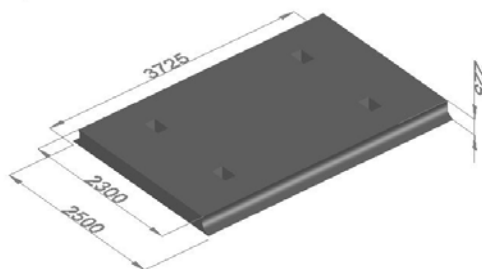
GFRP in precast panels and barrier walls (Young et al. 2012)
